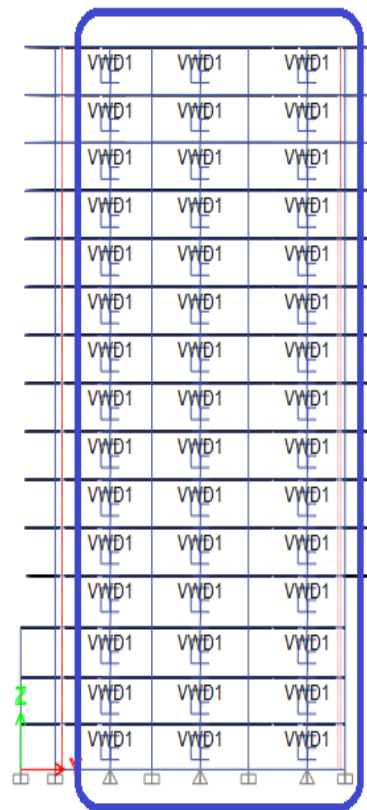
ETABS, Typical Elevation- Y with Dampers – VWD1
